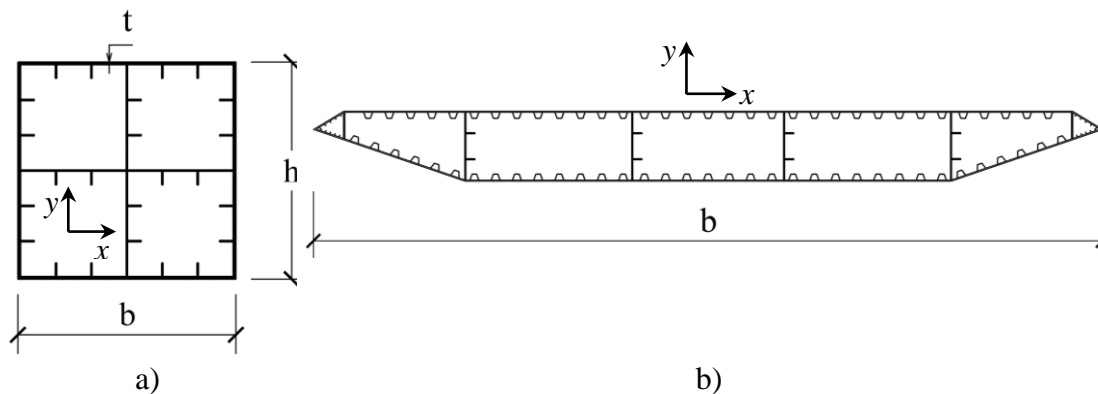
Geometry and Section of structural elements of the cable-stayed bridge. a) Closed box section for pylon, transverse and base pylon b) Deck section
